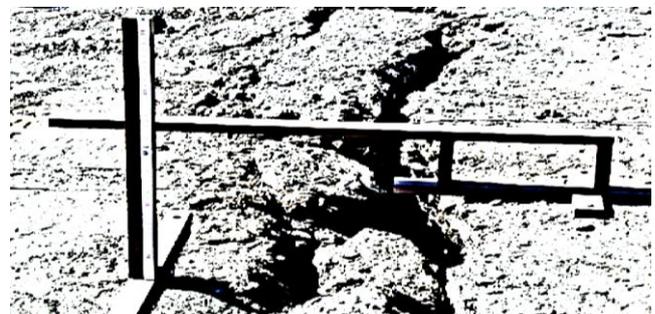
Wireline extensometer installation in tensile cracks developed area near to slope failure zone [29]
